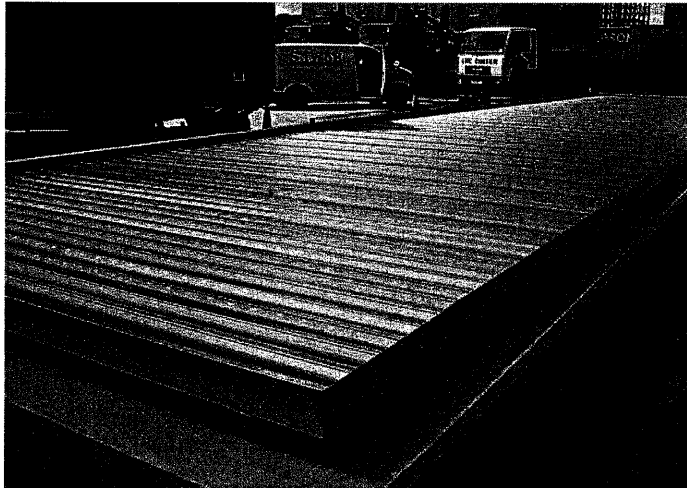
Finished Metal Decking Supported by Elastomer Bearings
